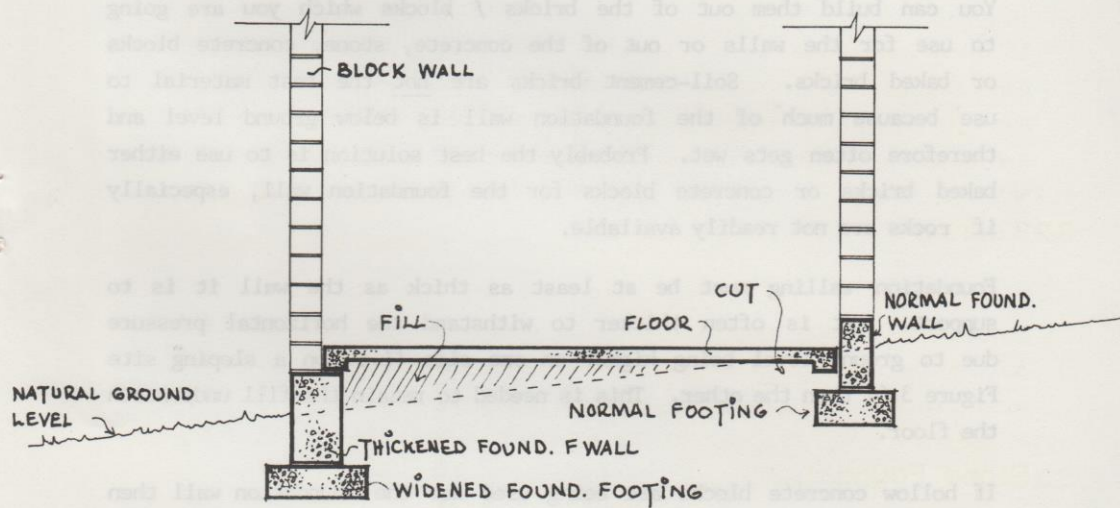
FOUNDATION DETAIL FOR A SLOPING SITE
